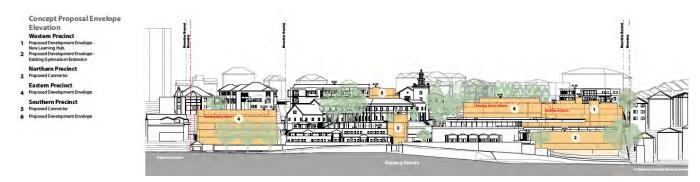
Elamang Avenue Elevation - Concept Proposal
